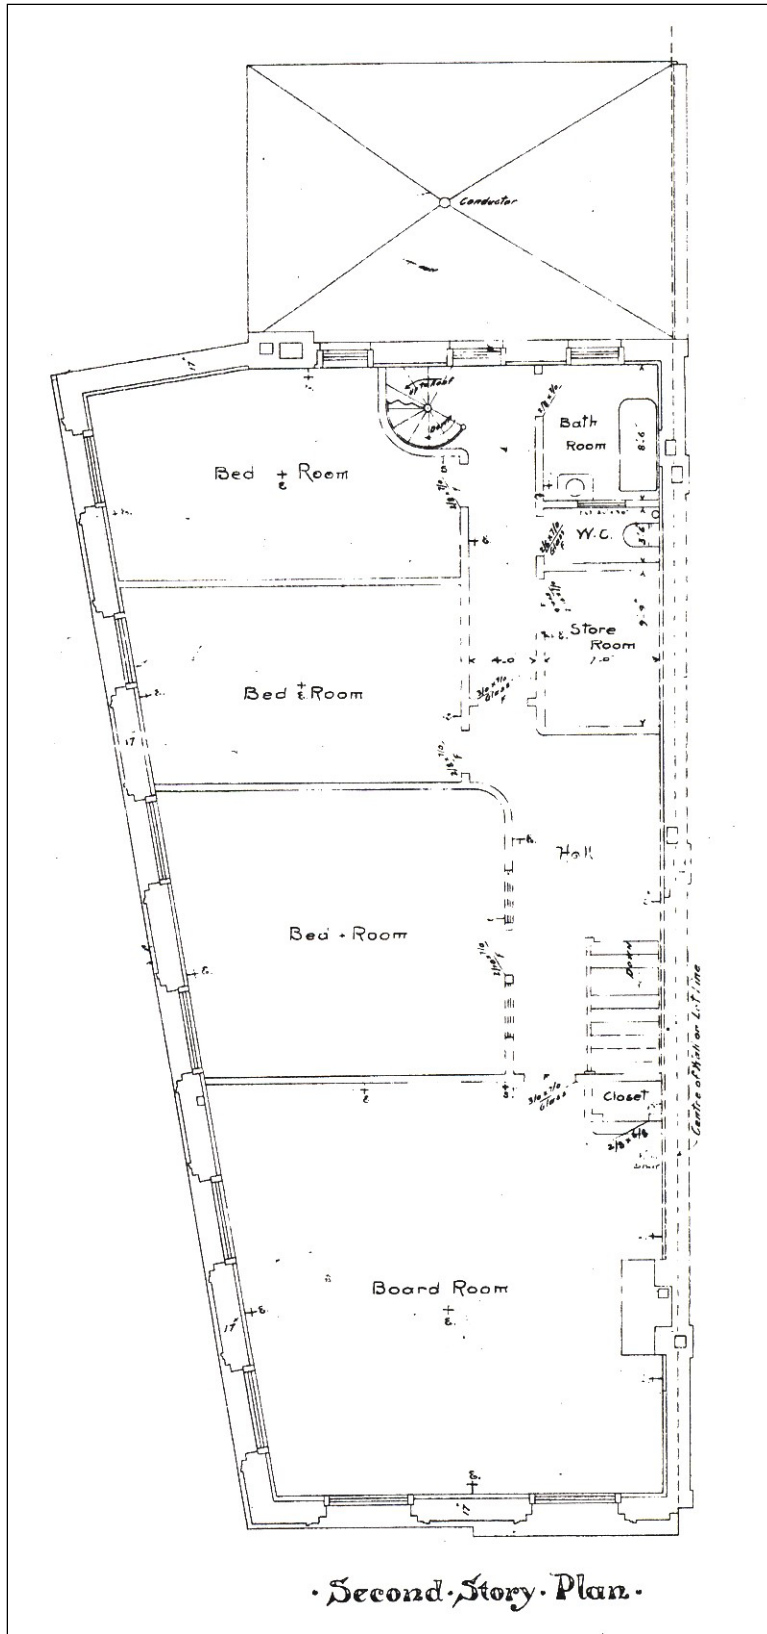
Architect’s Plans, “Second Story [sic] Plan,” 1901. (Courtesy of the City of Winnipeg Archives, Plan #961/1901.)
